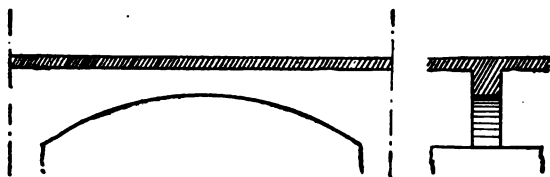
Hennebique Arch Rib and Flat Slab Construction.
